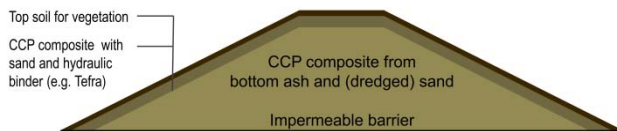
Recommended general cross-section of the dike constructed made with CCP composites
